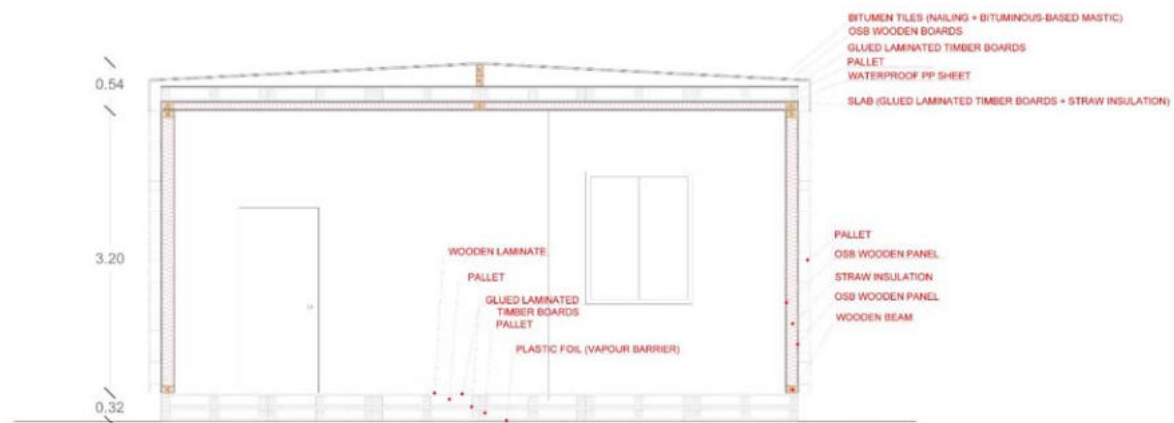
Pallet Shelter - Section and details of walls and floors<sup>17</sup>
